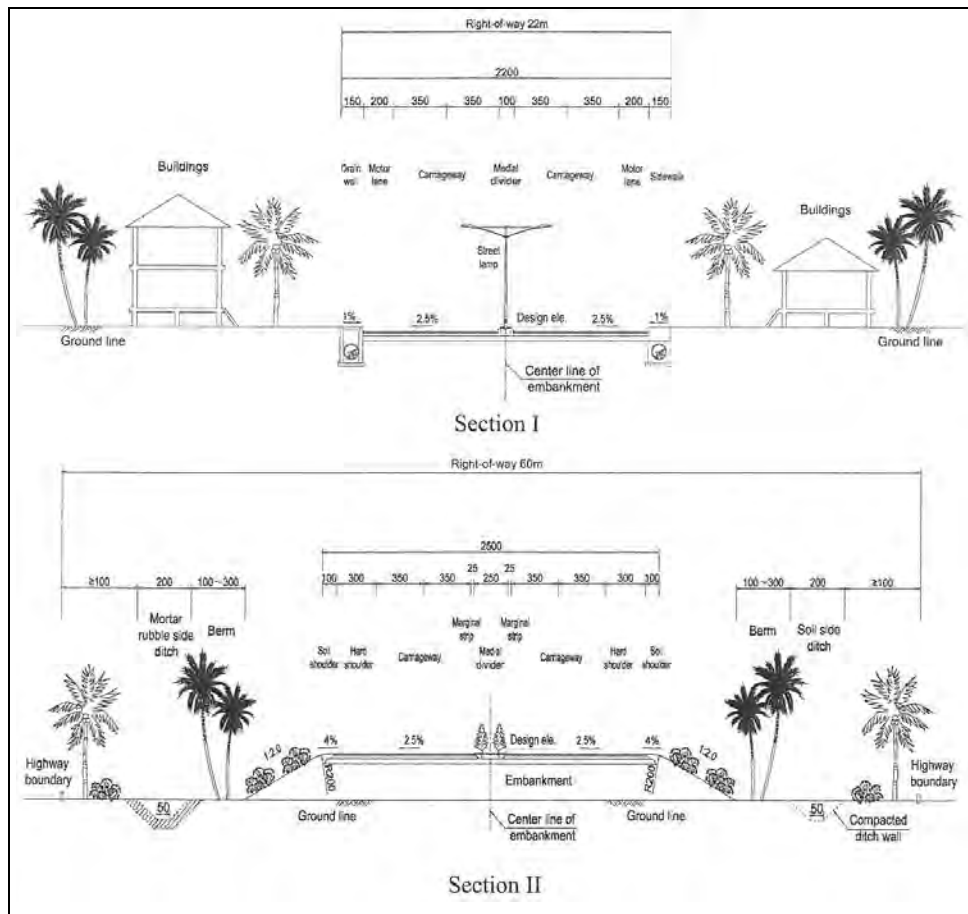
Typical Cross Section of Widening Under Chinese Fund
